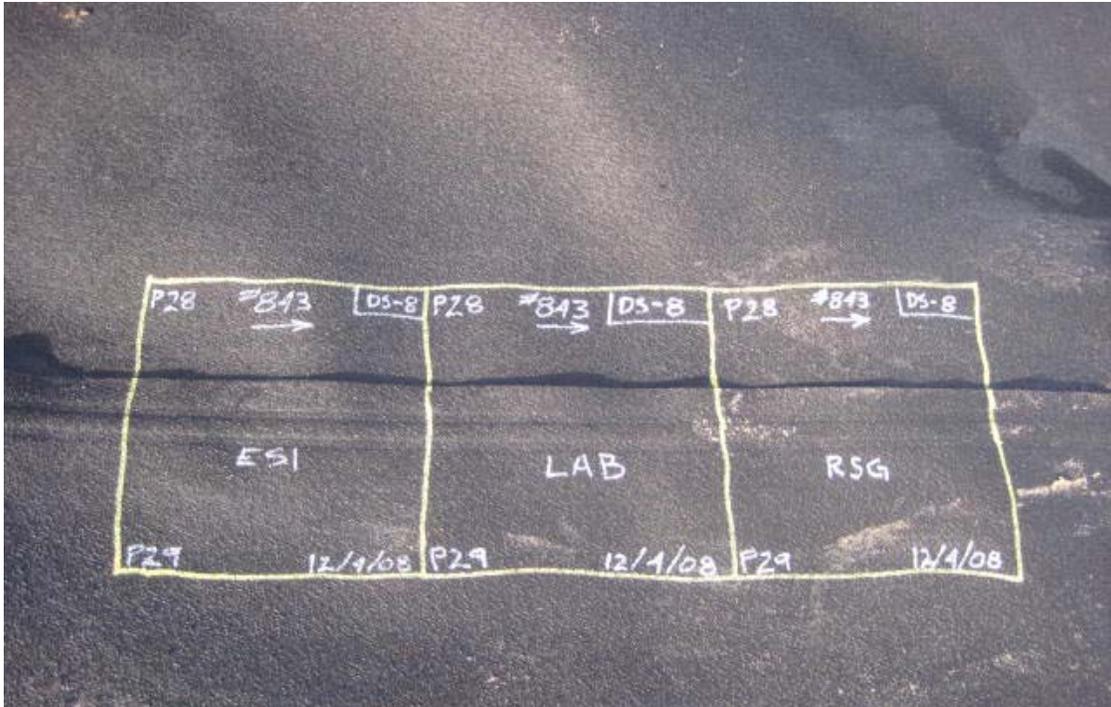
Layout of a typical destructive seam test location, showing samples for the installer, the laboratory and the engineer (12/3/2008).
